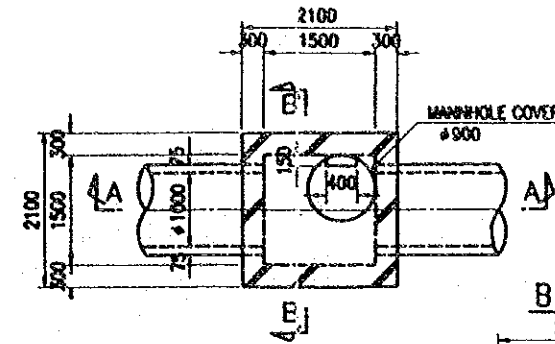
DETAIL FO MANHOLE FOR SEWER PIPE (1/2)
